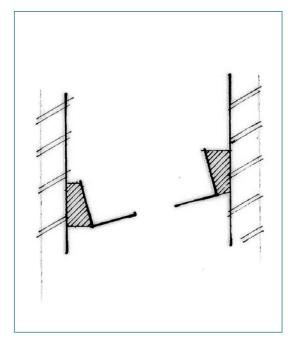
Wall shims, used at edges of ceilings to accommodate sloped ceilings.
